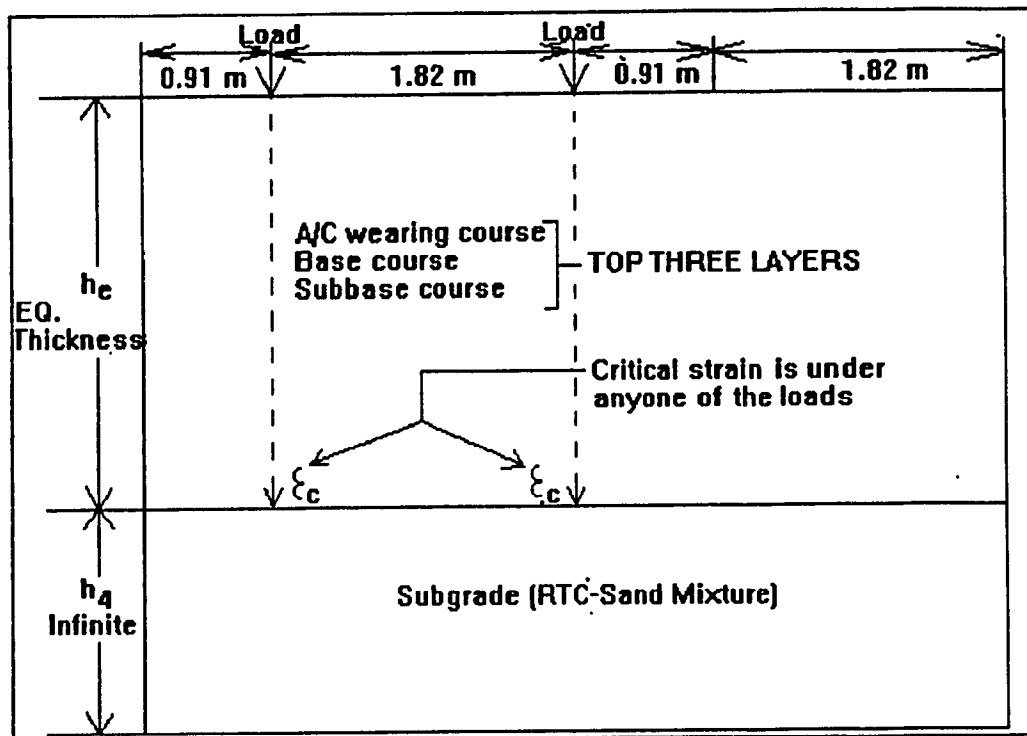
(a): Pavement model showing the equivalent thickness of top layers over subgrade.
